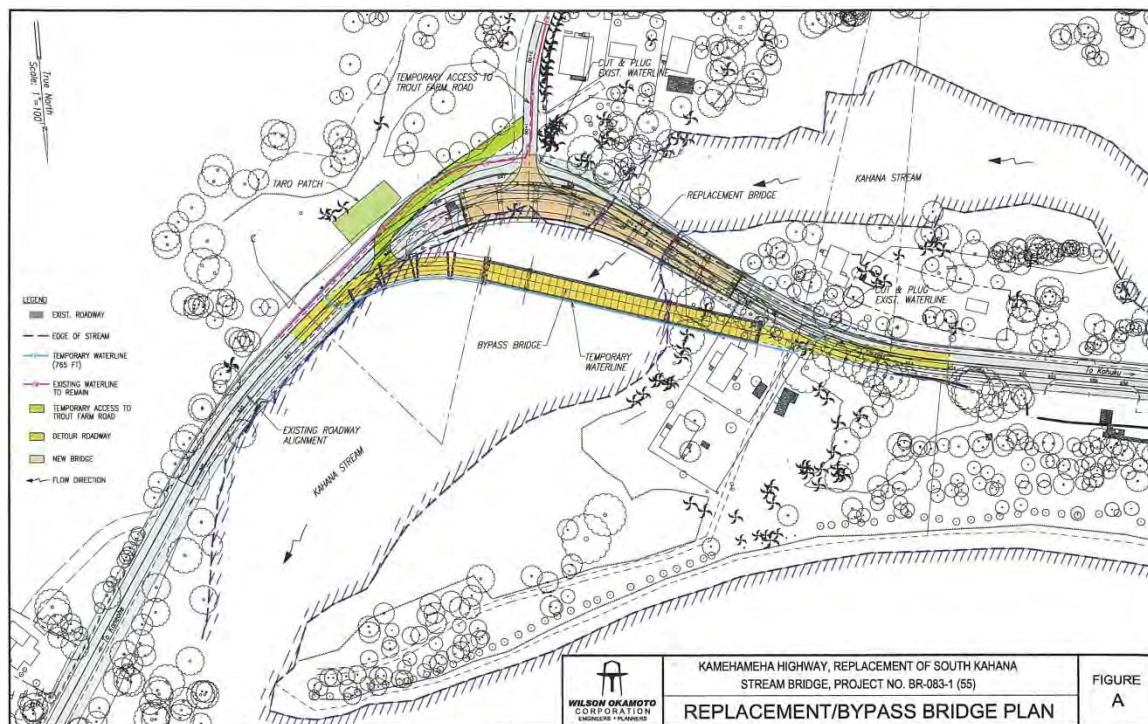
South Kahana Stream bridge replacement and bypass bridge plan.
